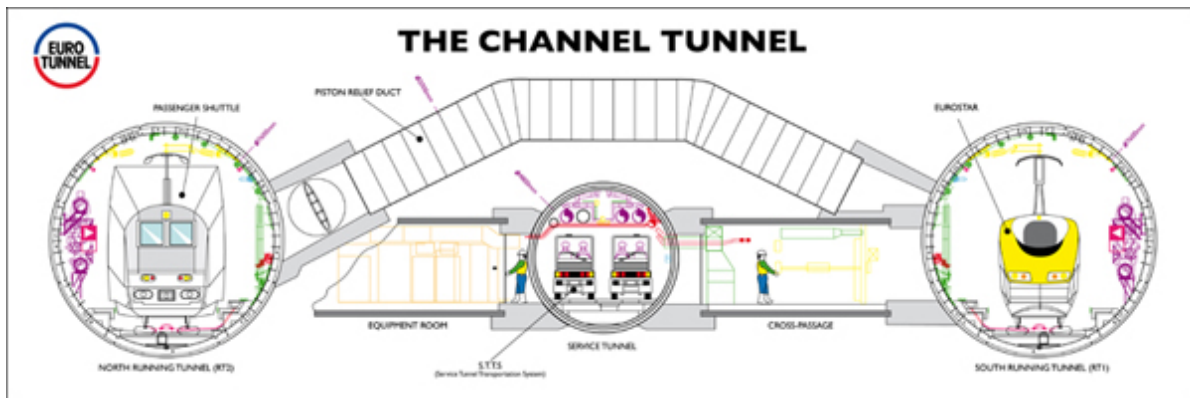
The Channel Tunnel cross section (GETLINK, 2009)
